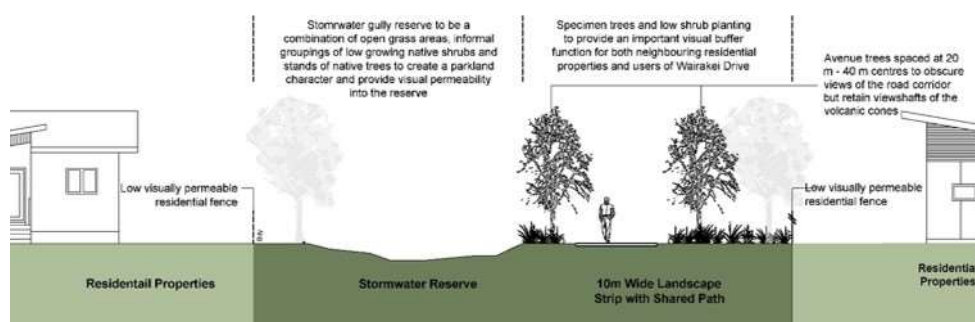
A: Cross section illustrating the Wairakei Drive road frontage design
